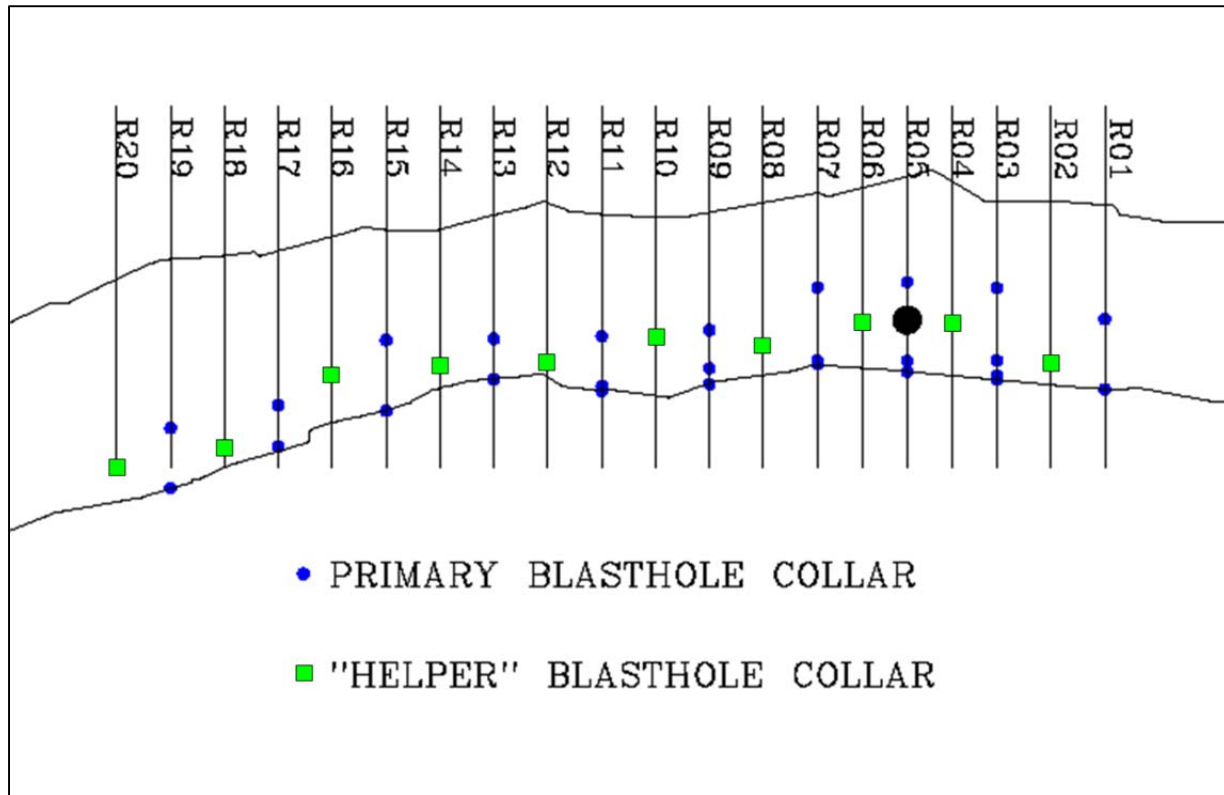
Plan view illustrating the dice-five/dice-seven drilling pattern layout.
